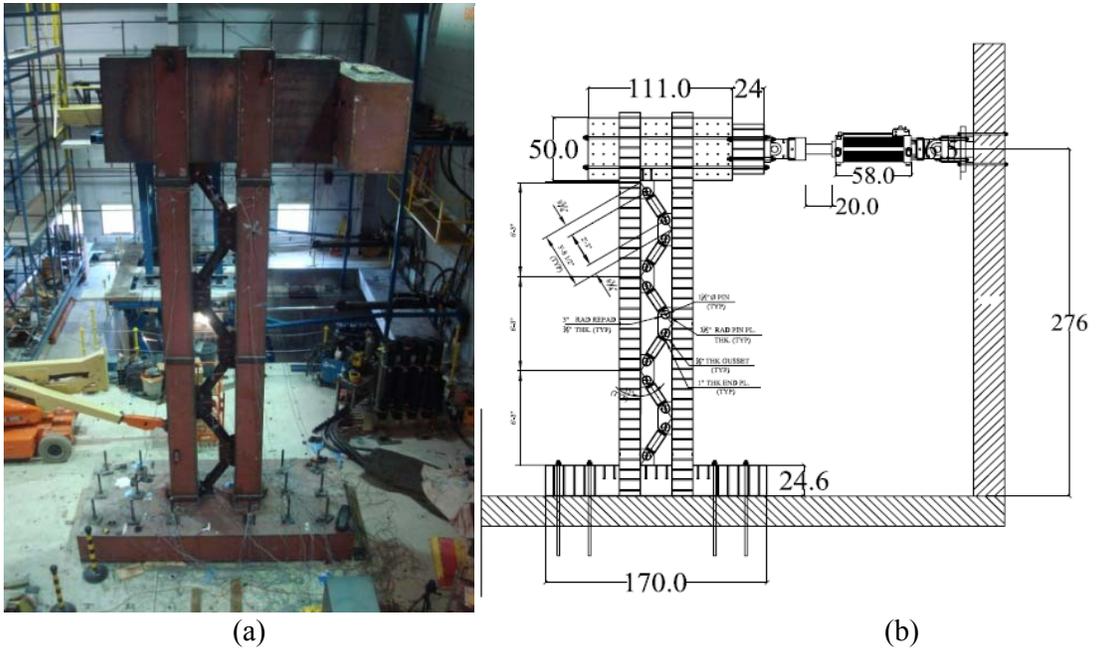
Experiment Setup (a) General View of the Experiment, (b) Bridge Pier with BRBs
